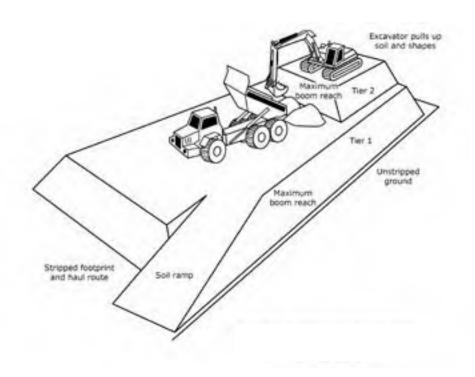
Soil storage mound construction with excavators and dump trucks: Multi-tier mound.
